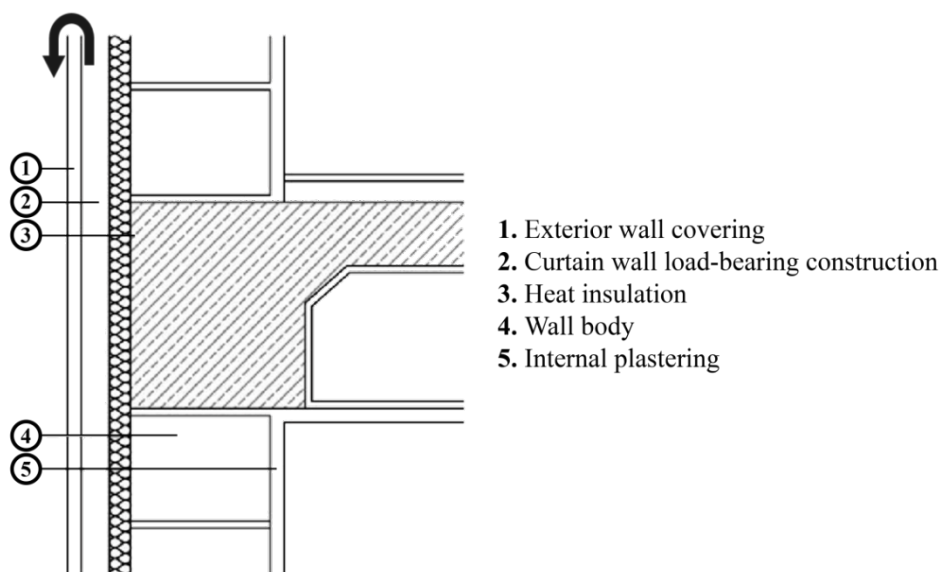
Ventilated Exterior Wall Thermal Insulation Application (TSE 825, 2008).
